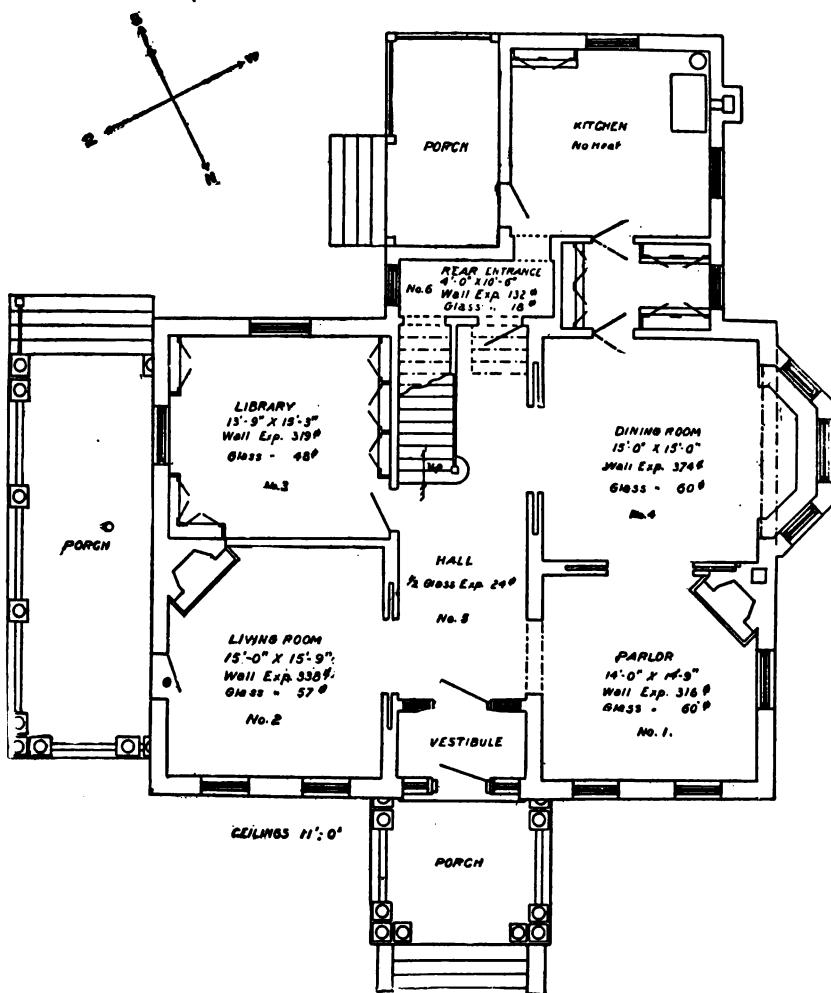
First Floor Plan, Giving Square Feet of Wall and Glass Exposure
